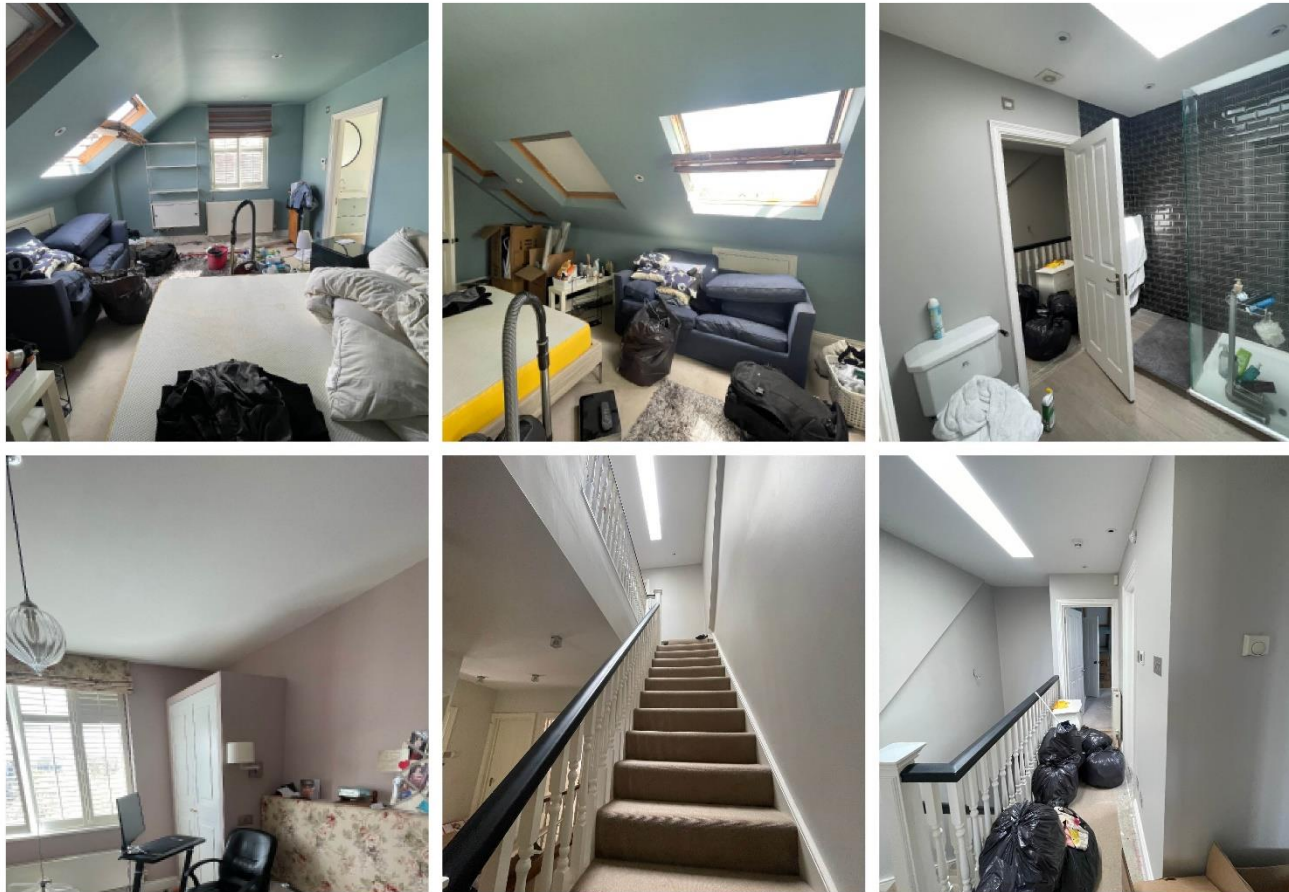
Second Floor Photographs as Existing – Reading Top Left to Bottom Right; Bedroom 06, Bedroom 06 (Front), Family Shower Room, Bedroom 04 (Rear), Stairwell, Bedroom 04
